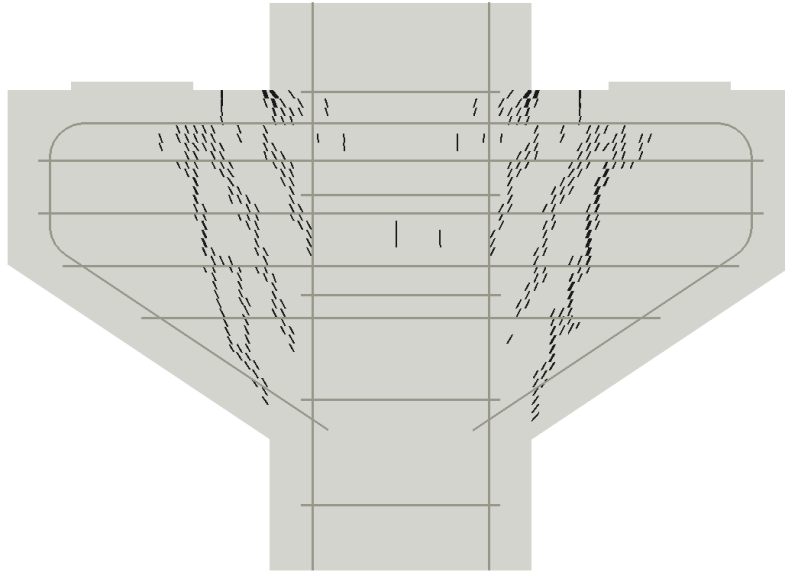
Crack model, with a minimum crack width of 0.05 mm, at a vertical load of 815 kN.
